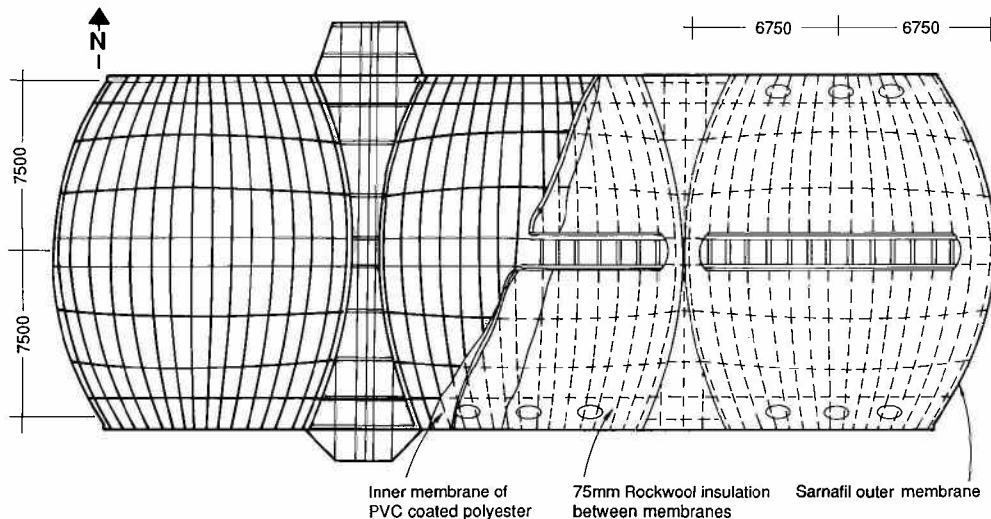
Plan of shells showing arches, windows and membranes of roof
